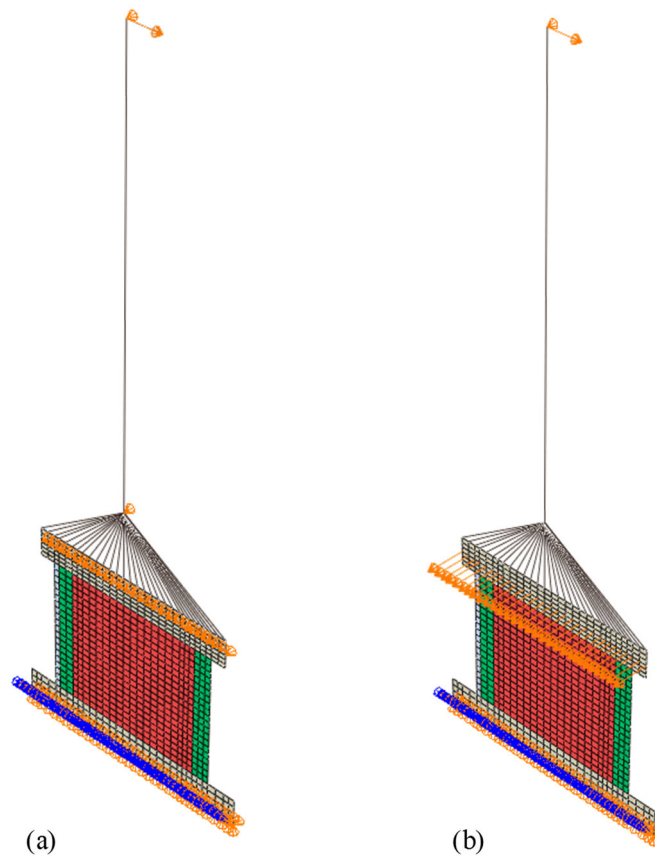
Detail of boundary and loading conditions in NLFEA: (a) TW1 specimen and (b) TW4 specimen.
